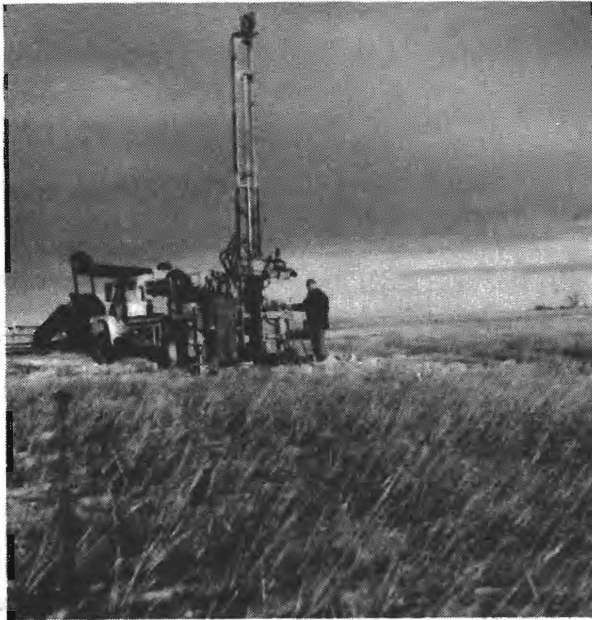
Installing piezometers at the Winderl site (L., Pat Murphy, R., Dave Lechner).
